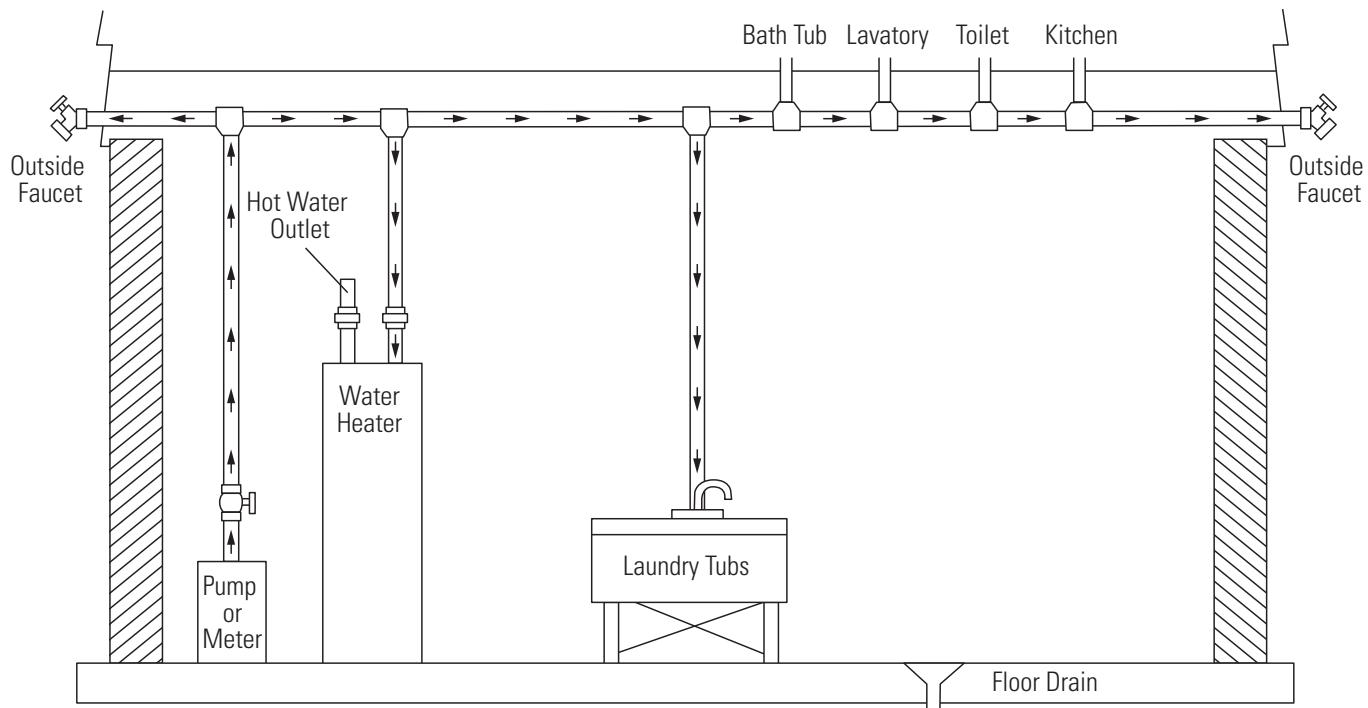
Standard Basement Before Installation. Cold Water Lines Shown
